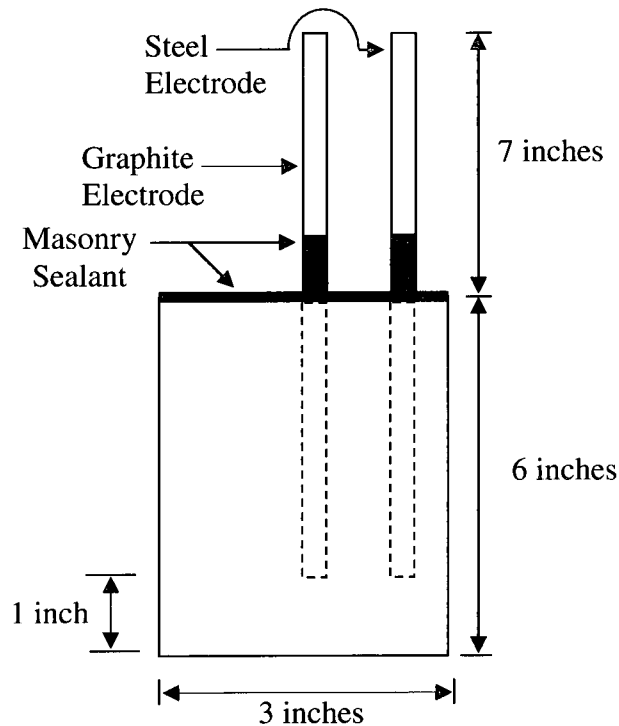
Front view of the reinforced cylindrical concrete specimen
